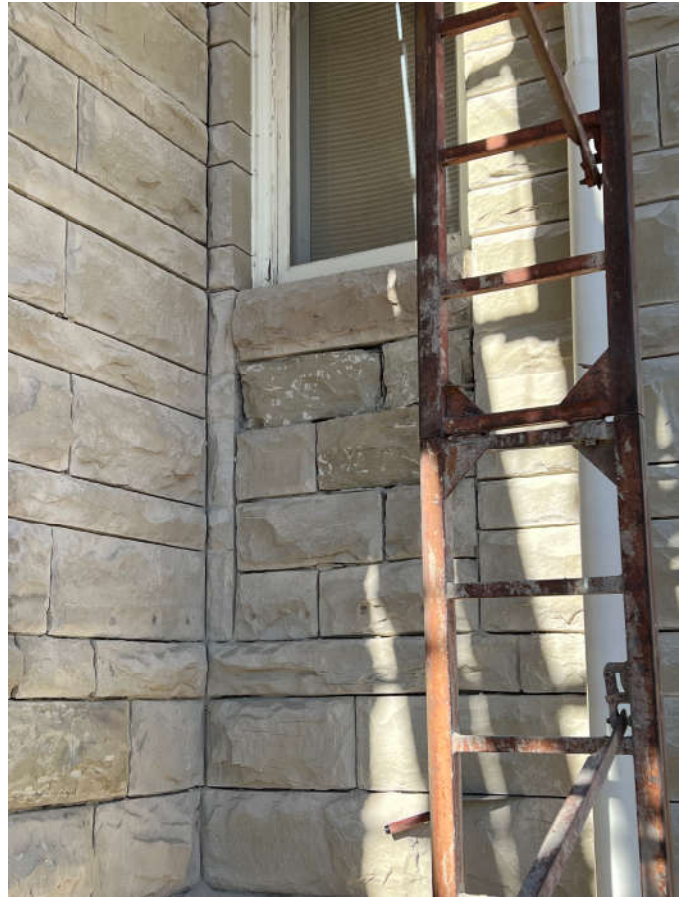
The stones below the window at the infilled opening are specified to be replaced.
